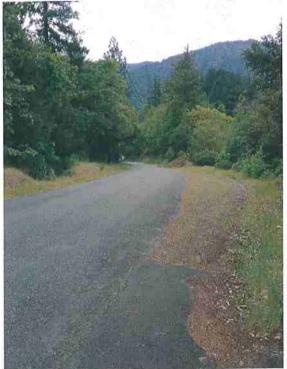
BMR PM 0.2, 21 ft.-wide asphalt surface with a longitudinal slope of 10%, view looking downslope (east) with 10-ft. wide shoulder.
